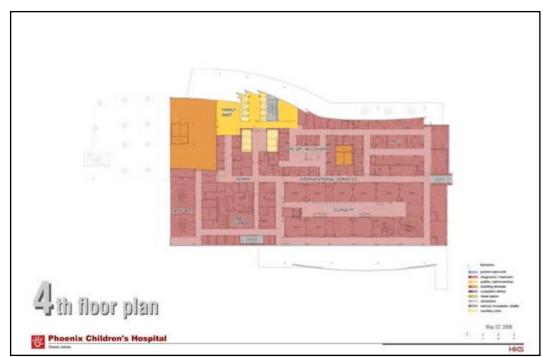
20 Fourth Floor Plan, Phoenix Children's Hospital
